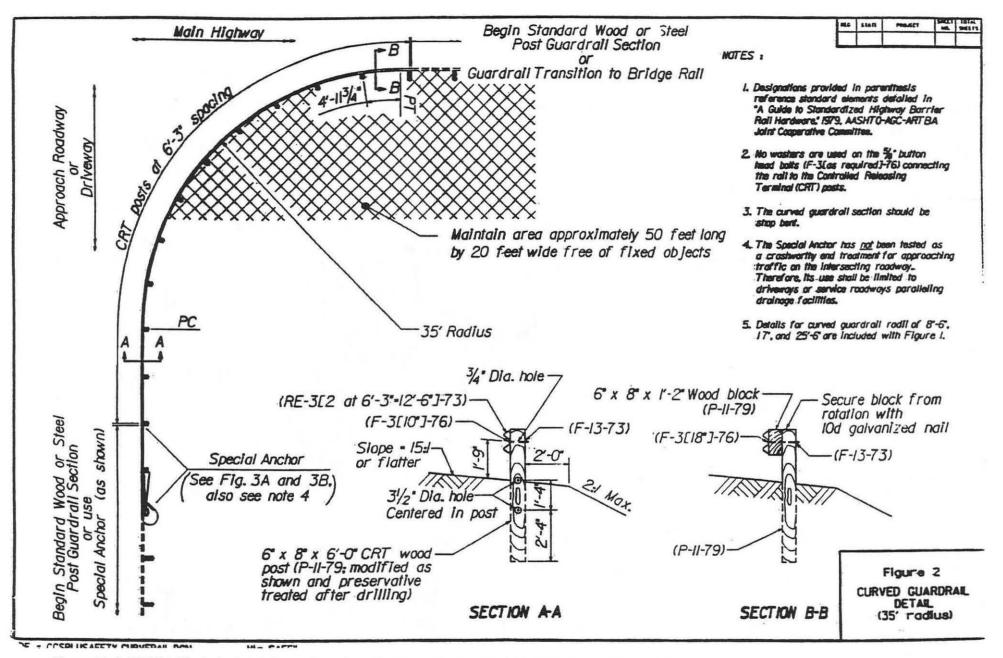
FHWA Technical Advisory Drawings for Short Radius Guardrail Designs (9)
